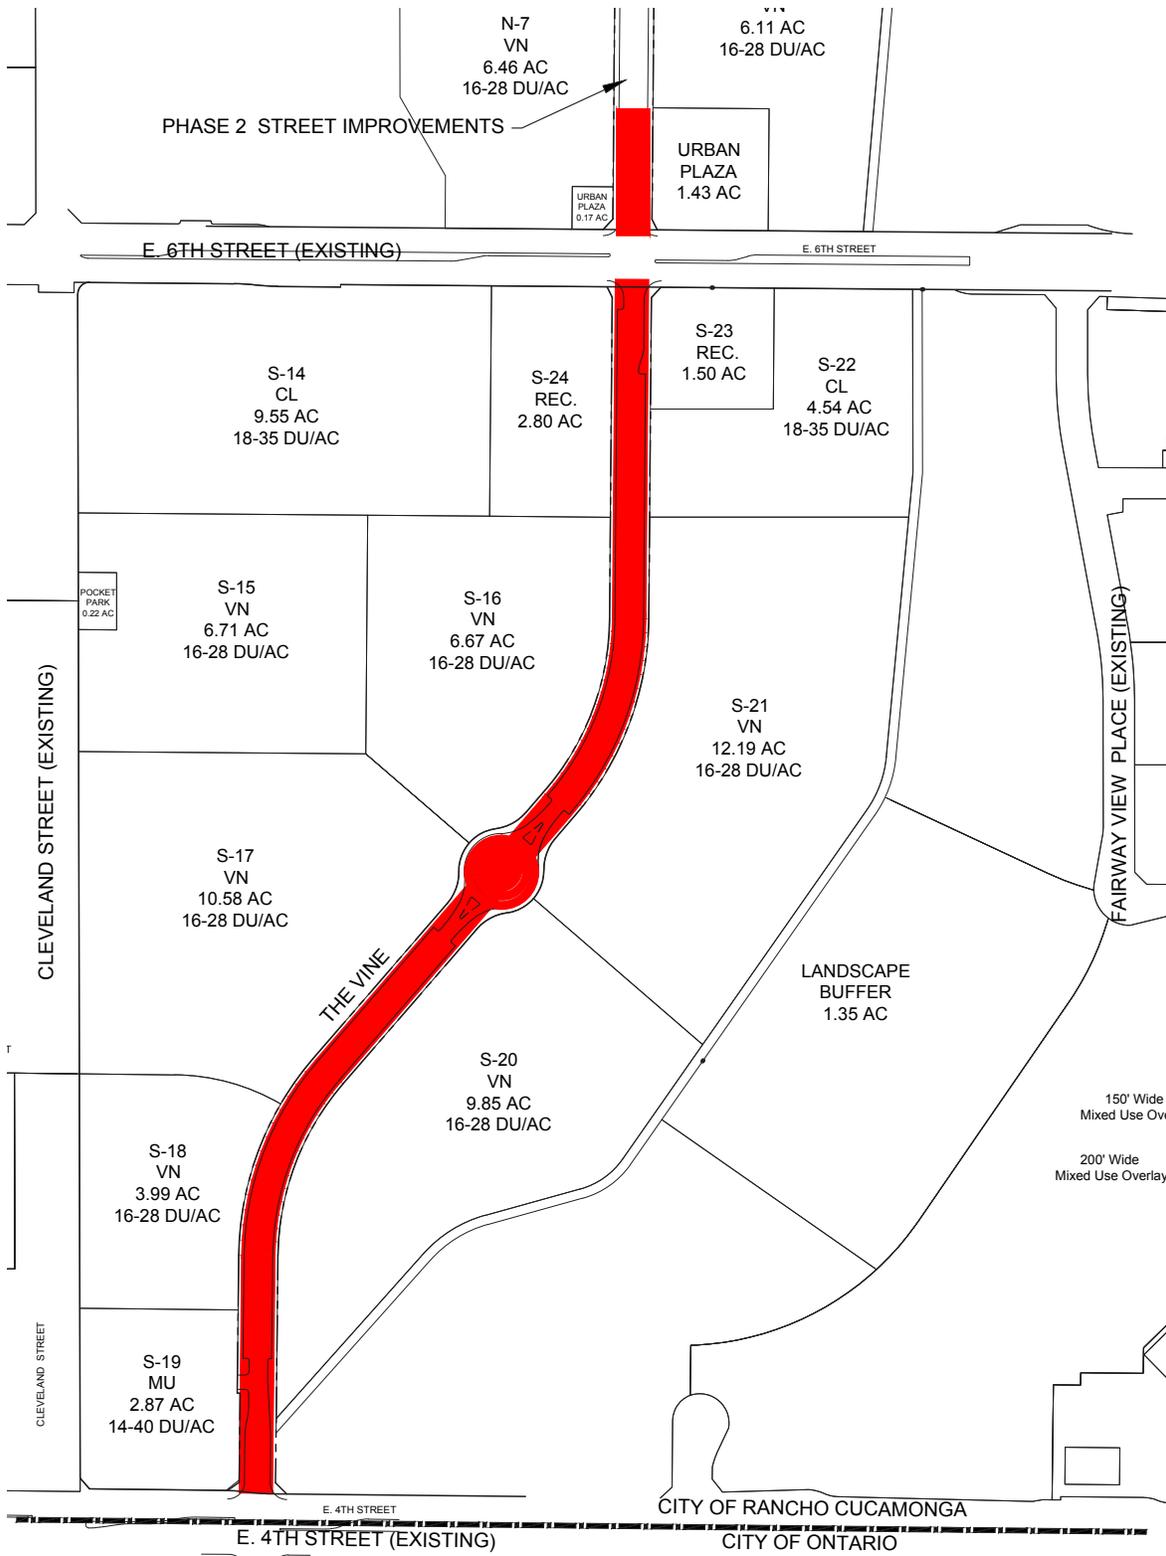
Conceptual Phase 1 Street Improvement Facilities Plan
